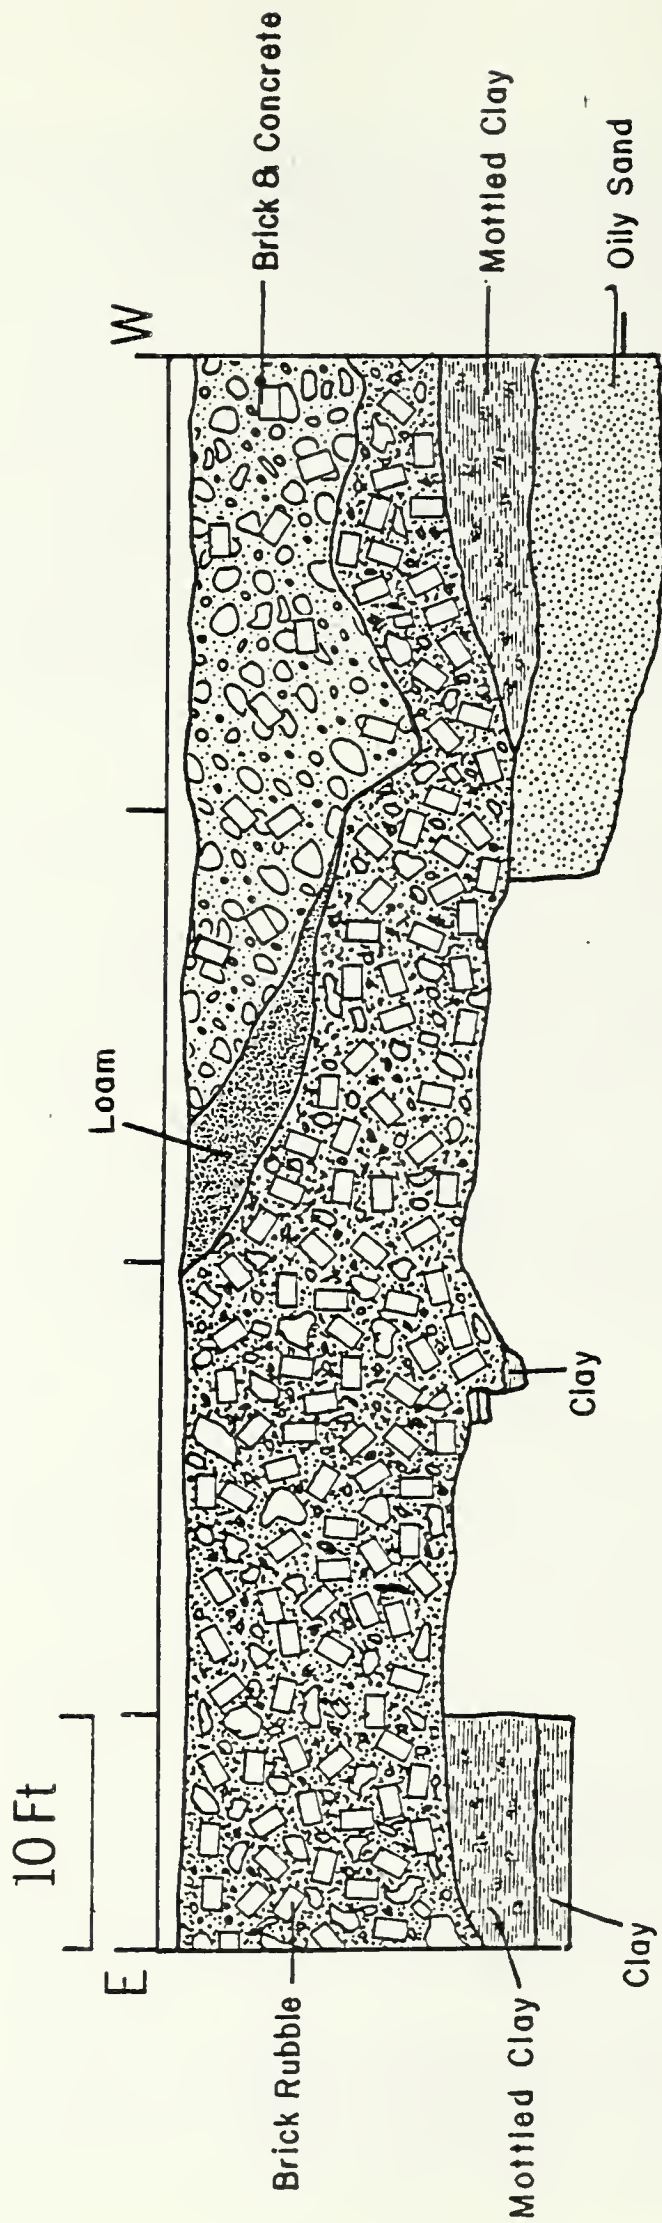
East St. Louis Gas Works, Trench Excavation, South Wall Profile.
